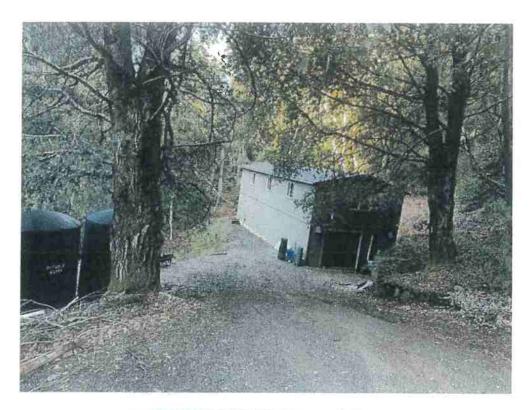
Site B center and Site A distant left. Note rocked V-ditch constructed to accommodate storm-water runoff from the graded flat. Photo date 1-17-2022.
